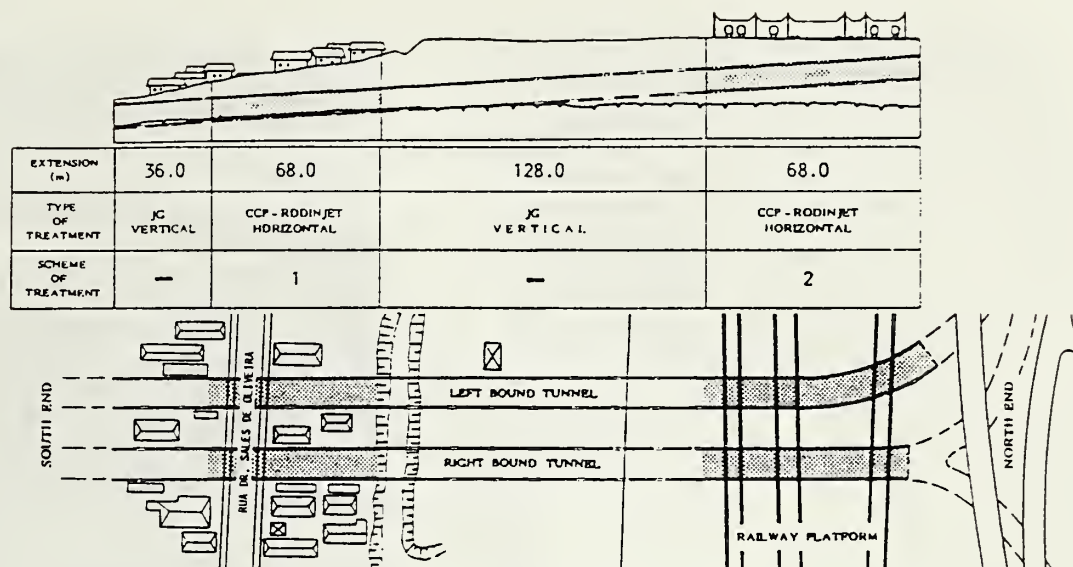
Campinas tunnels a) longitudinal section - b) plan view of twin tunnel
